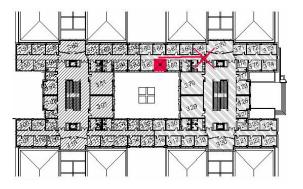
Trajectory of the second experiment over the floor plant of the School of Engineering Univ. de León.
